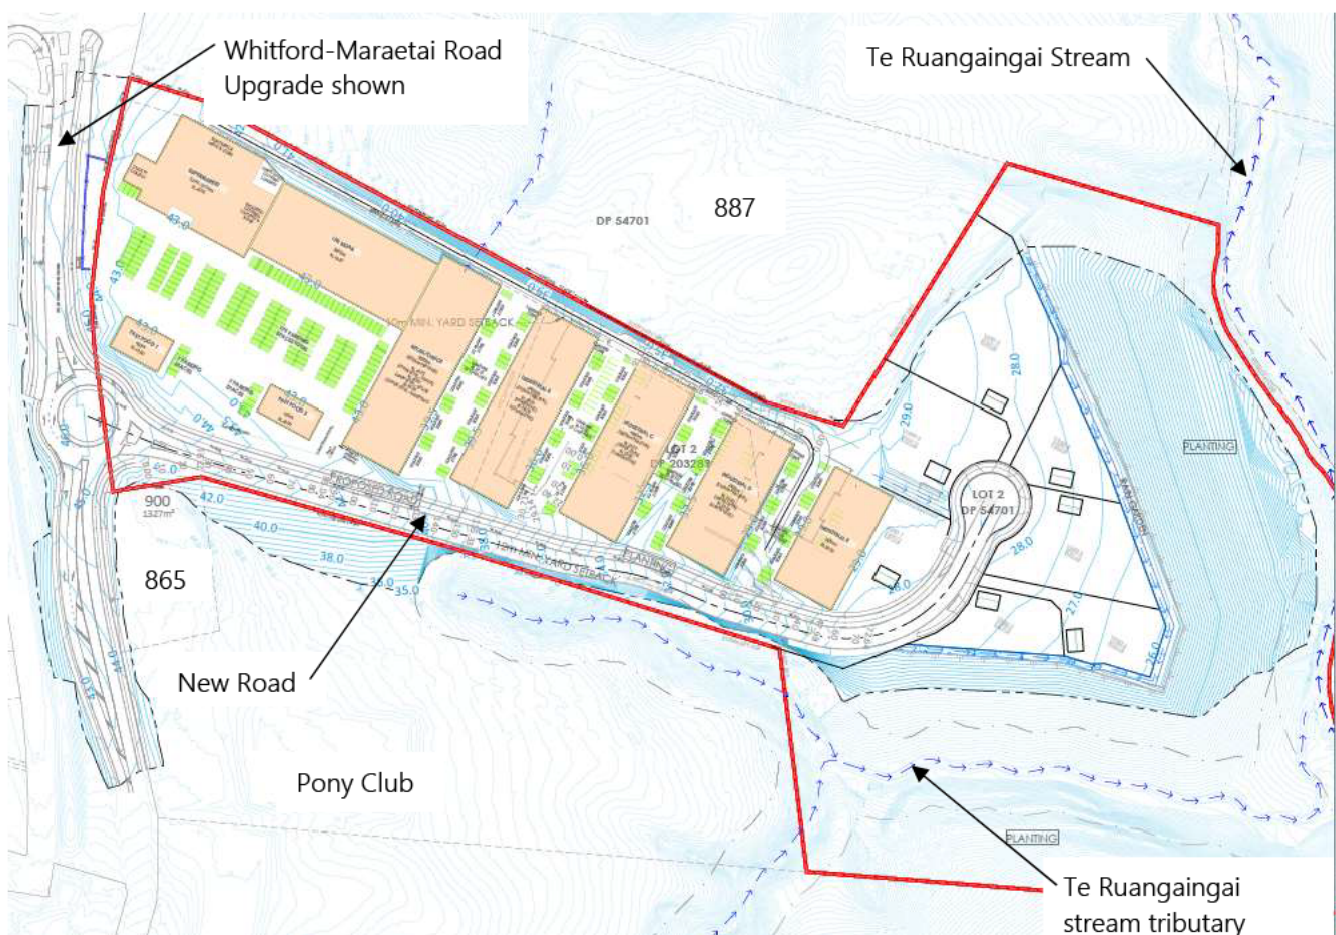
Concept plan for proposed application prepared by Civilplan dated 24-02-2025. For the purpose of this report, north is up the page.
